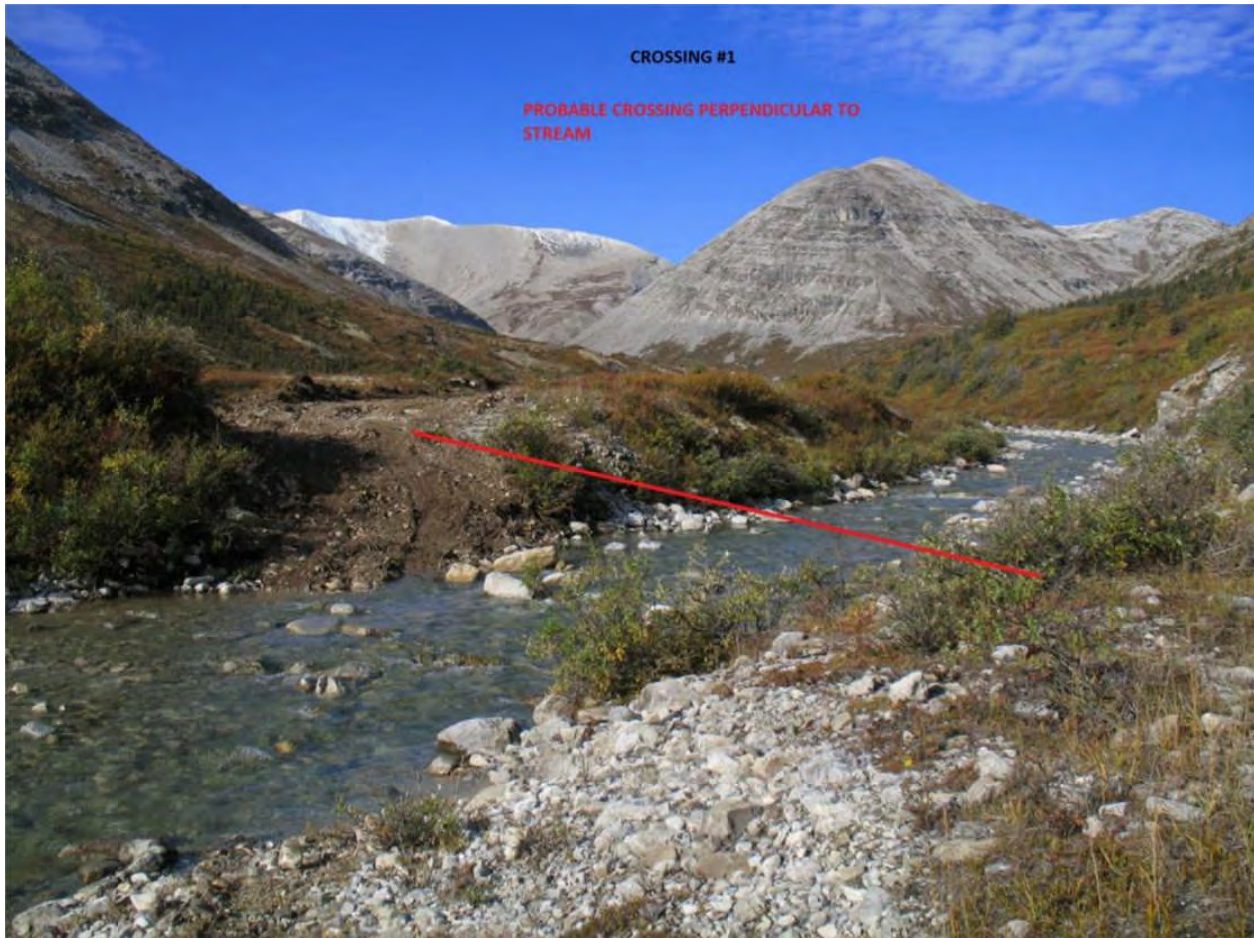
Sundog Creek Temporary Crossing 1, Road KM 24. Viewing upstream.
